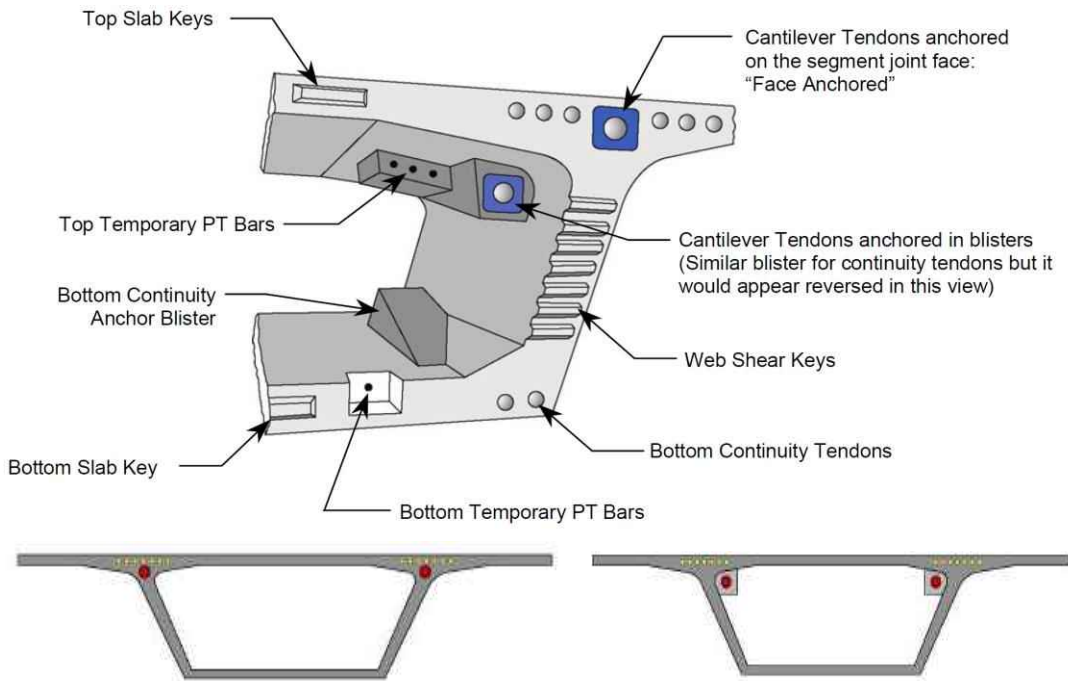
Precast segmental box girder with cantilever tendons (FDOT 2002-1)
